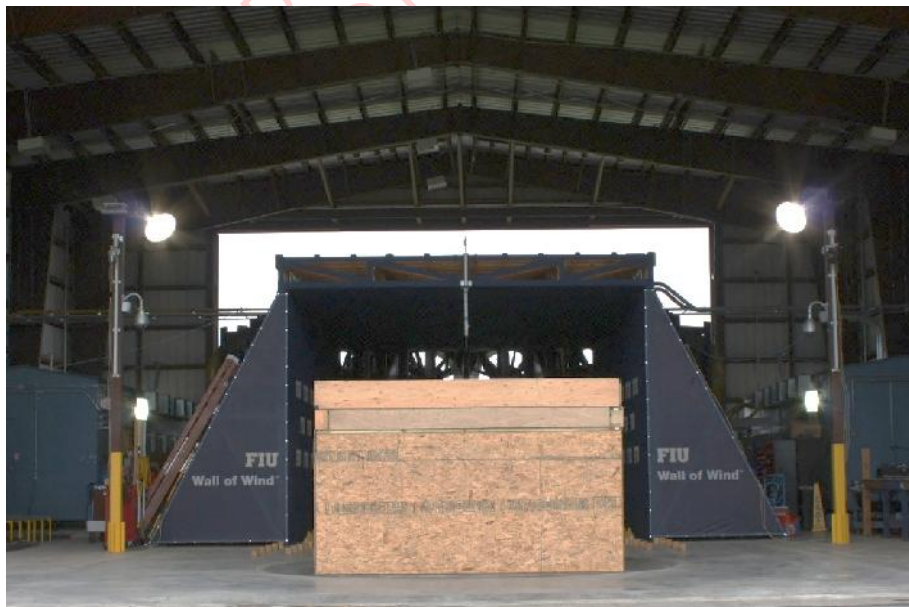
Base building with 9 in. parapet + 12 in. parapet on top of test section (looking upwind)
